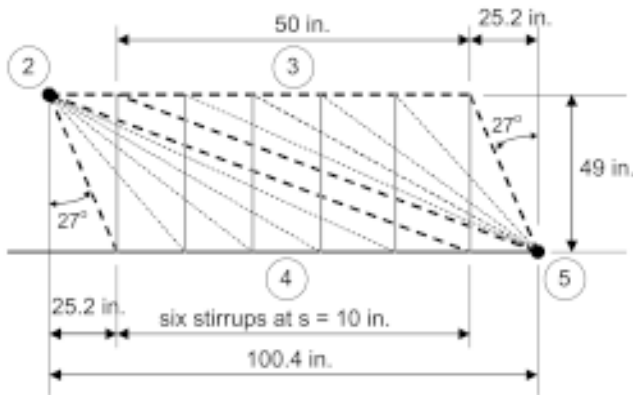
Fan-shaped Struts 2-4 and 3-5 in the right span of the beam engage several stirrups (1 in. = 25.4 mm)
